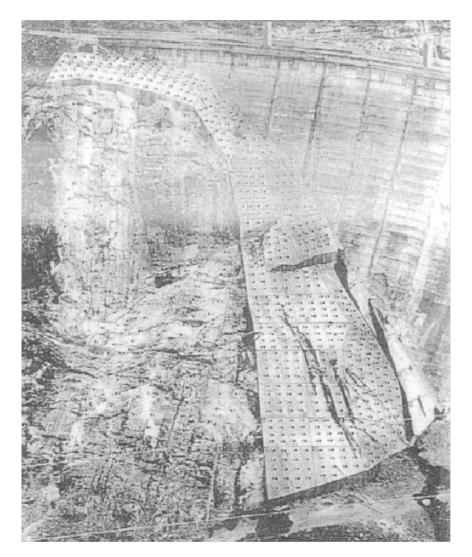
Construction of the overtopping protection on the right abutment. (Reclamation, 2006).
